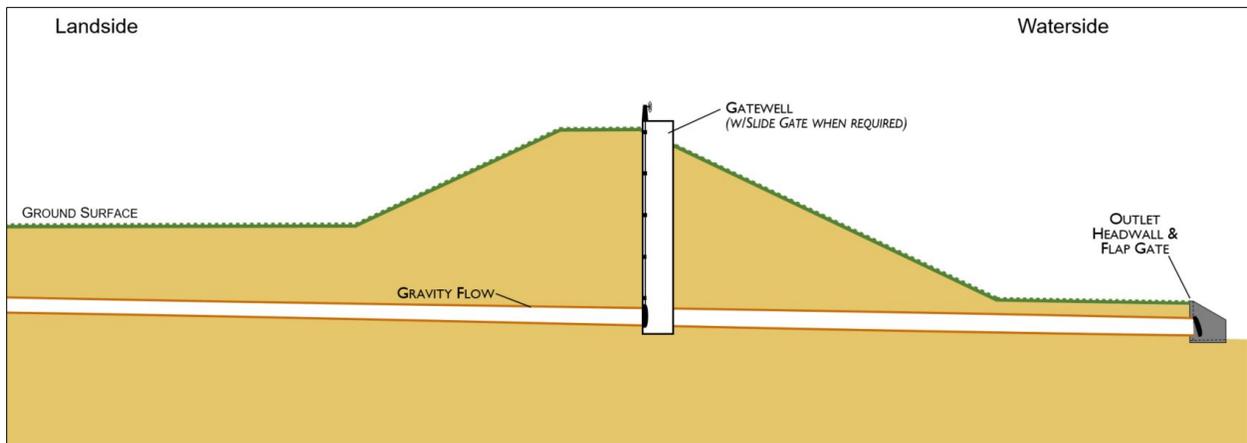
Cross-section of gatewell adjacent to waterside crest in levee embankment.
